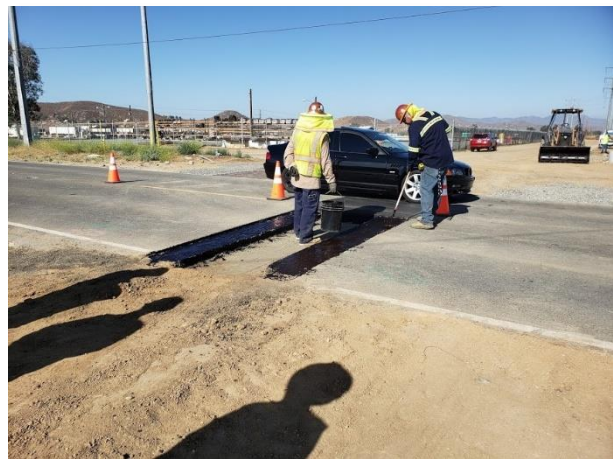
Paving activities on Menifee Road for the northern underground section near Valley Substation
